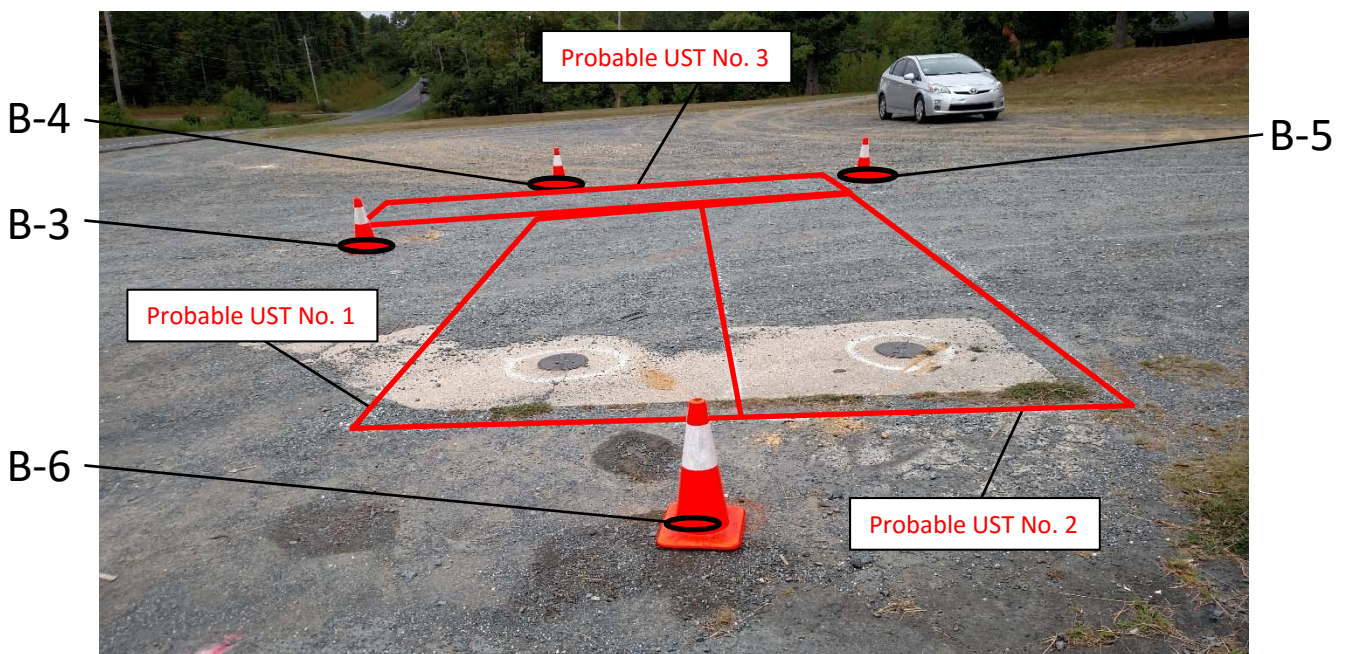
Boring locations B-3 through B-6 and three probable USTs located just west of the on-site structure, facing northeast.
